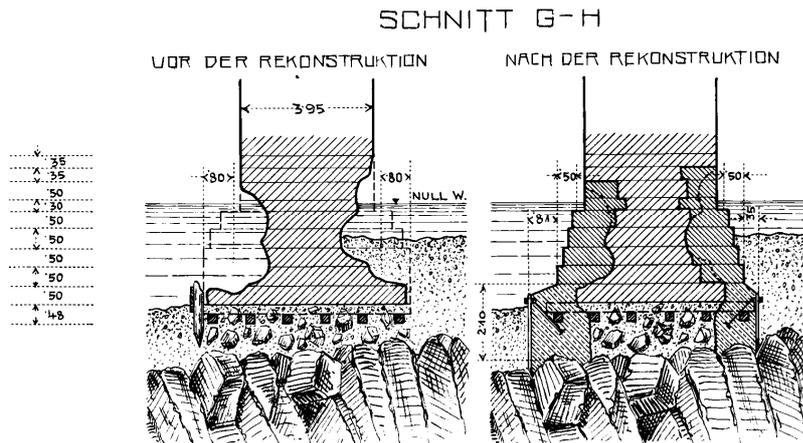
Pier 6, sec. G-H, plan of the existing condition and reconstruction proposal from 1911 (NMA c)
